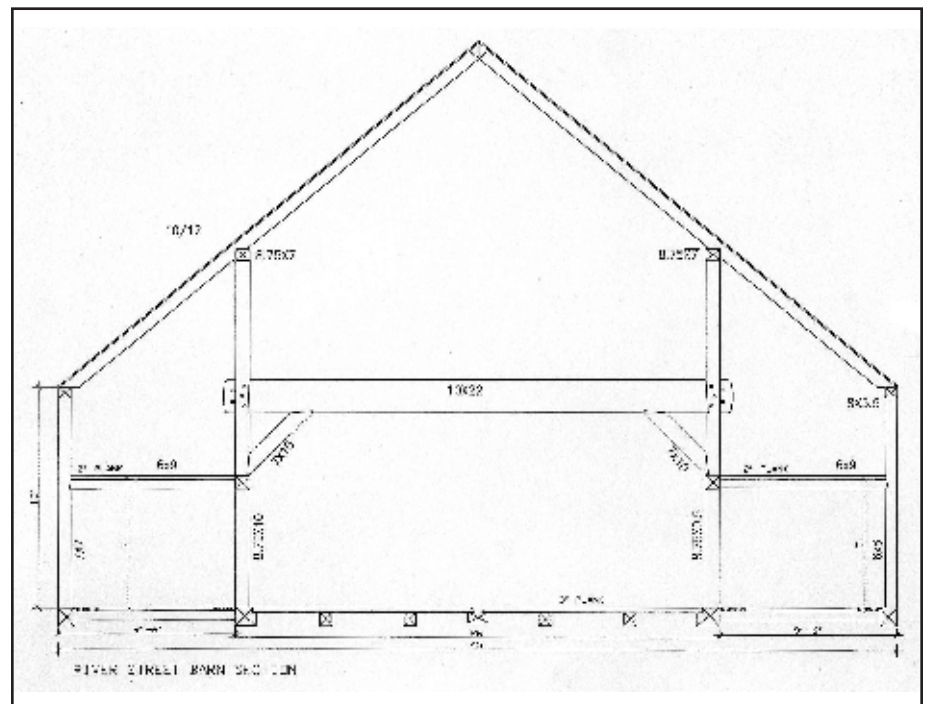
River Street Barn, typical bent section (Drawing by Keith Cramer).
